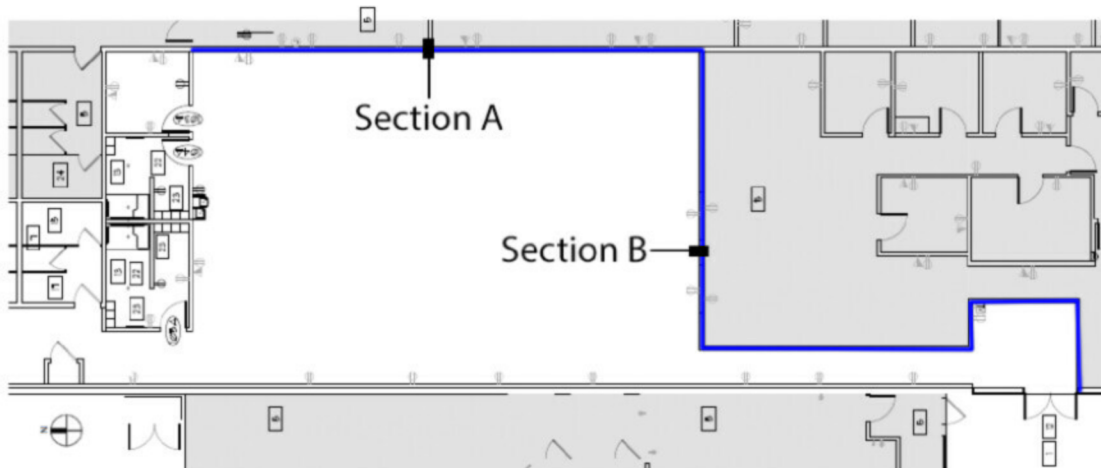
Highlight (Blue) of where additional noise insulating wall assemblies will be installed.
